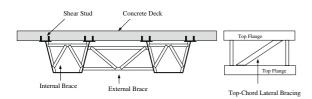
A typical cross-section of a trapezoidal box girder system.
